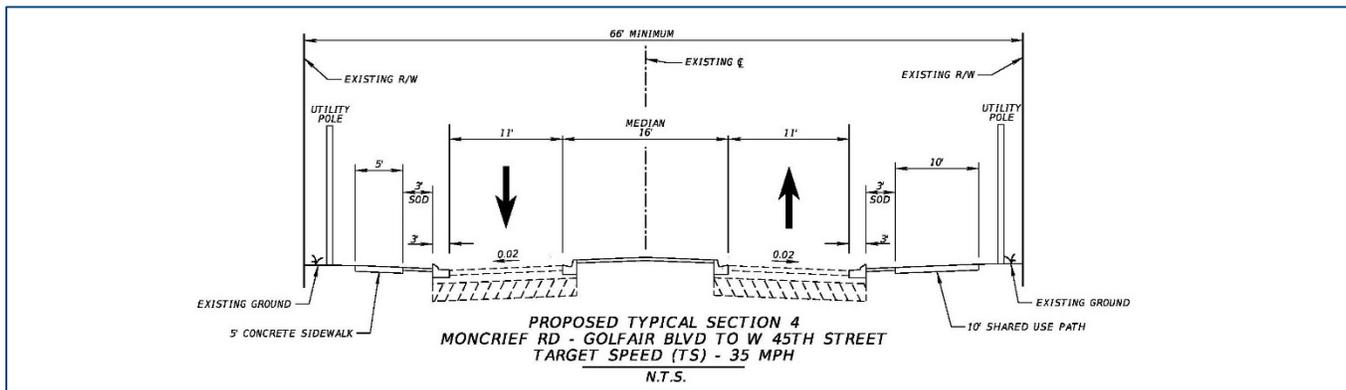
Proposed Typical Section (Golfair Boulevard to W. 45th Street)
